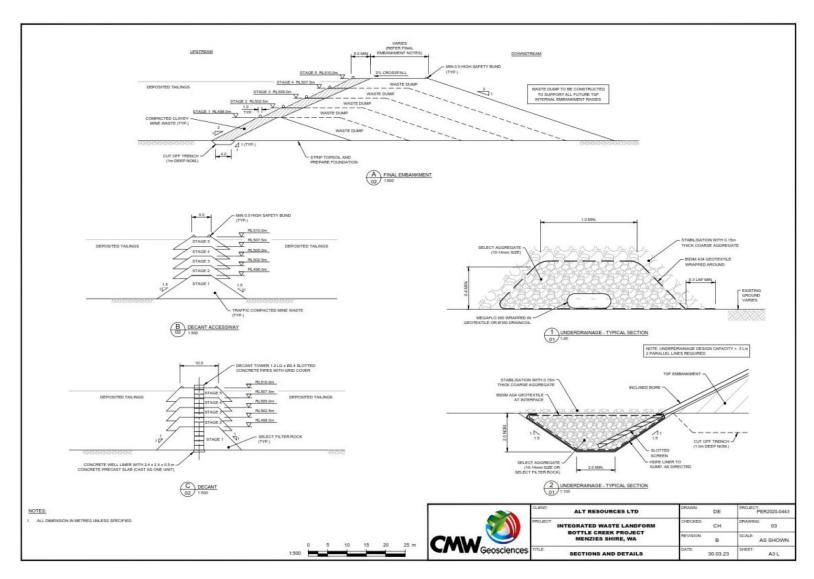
Integrated Waste Landform Tailings Storage Facility Section Details – Note Embankment stage 1 only approved under this works approval
